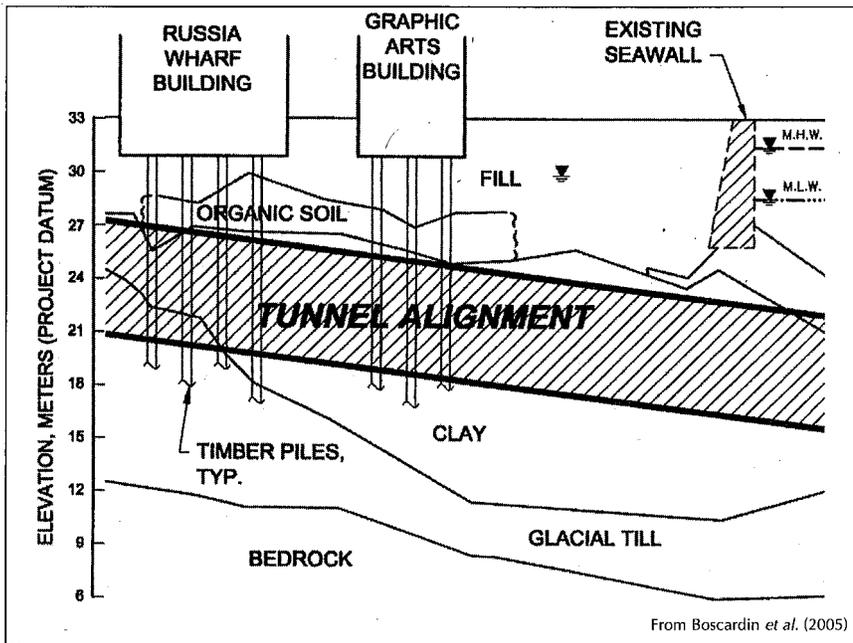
Section along the Silver Line Tunnel between the corner of Atlantic Avenue and Congress Street and the edge of Fort Point Channel passing beneath the Russia Wharf Building (view north).
